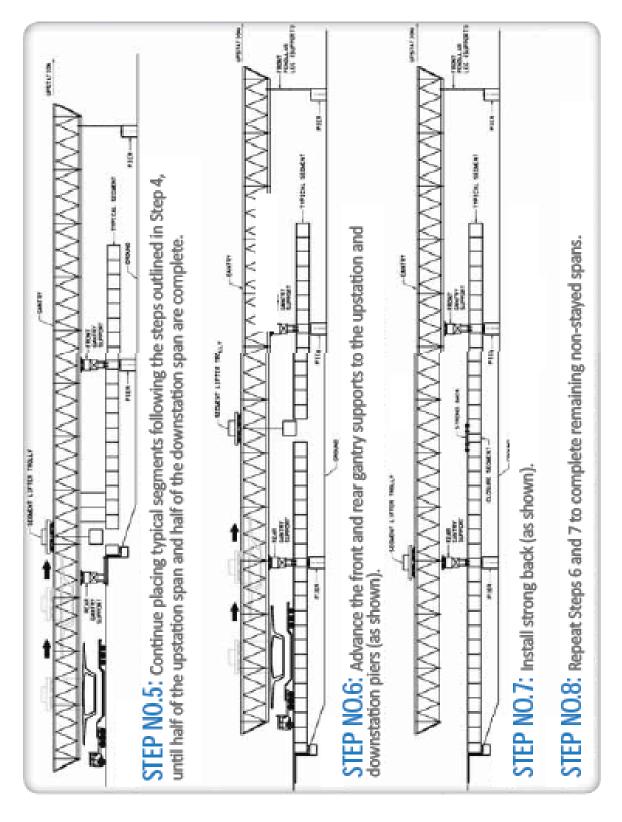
Steps 5-8 Span-by-Span Construction with Overhead Gantry
